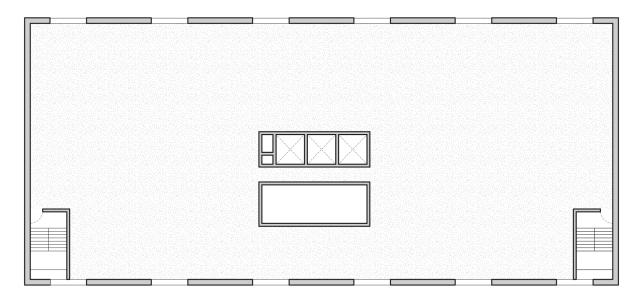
Current plan of unoccupied office levels in the secretariat tower.
